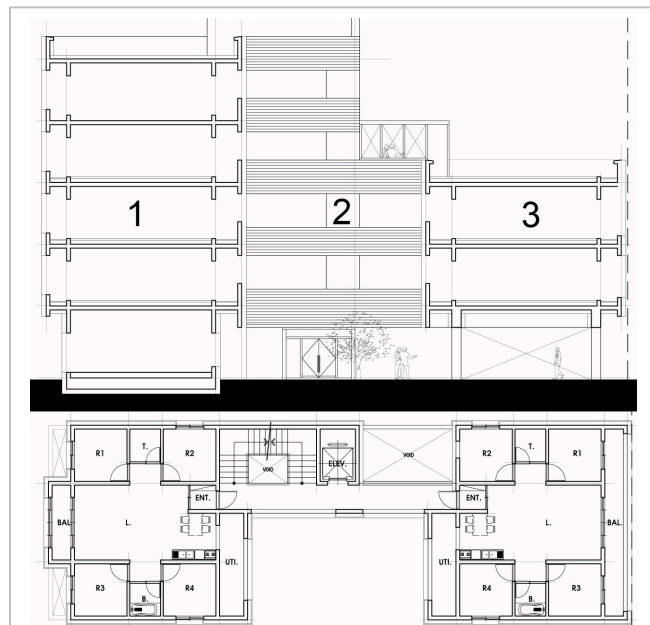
Exemplary floor plan (bottom) and section (top) of the selected residential building in Seoul; the building parts 1 and 3 will be insulated according to passive house standard, while part 1 will be not heated and constructed separately.
